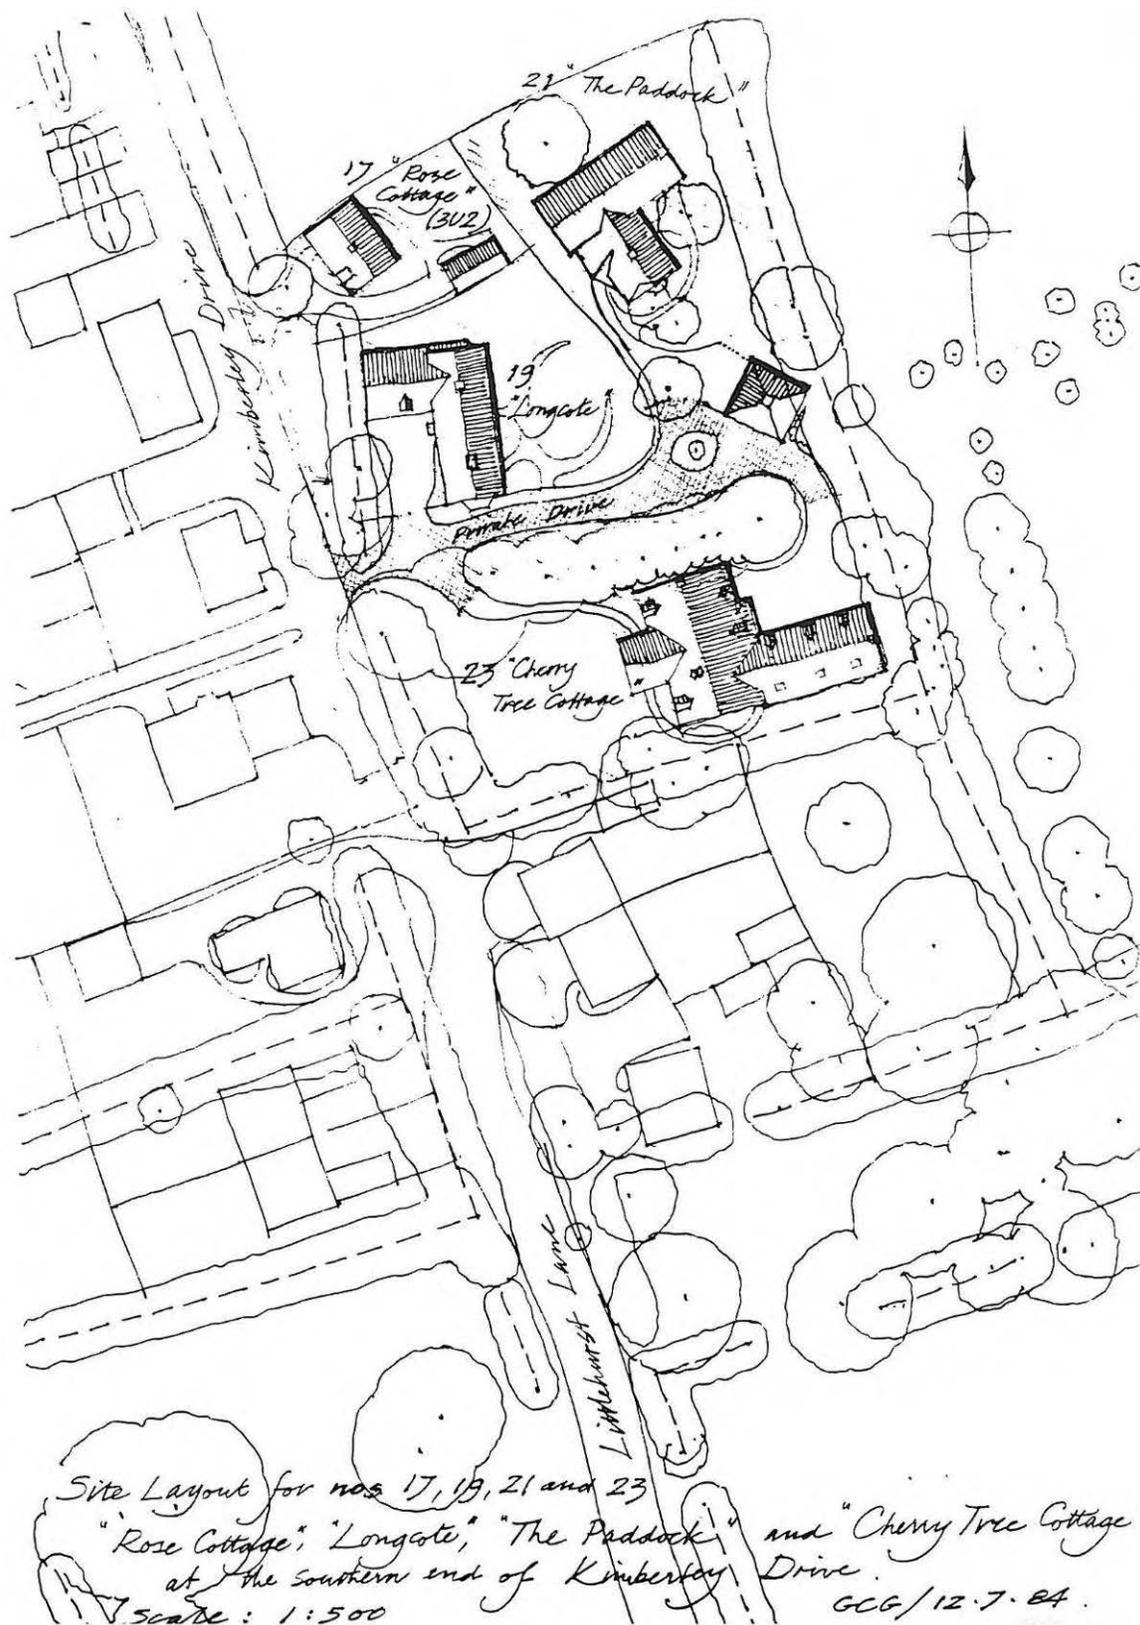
George Garrard's plan for nos 17-23 Kimberley Drive. Note the separation of Kimberley Drive from Littlehurst Lane to avoid a long straight road.
